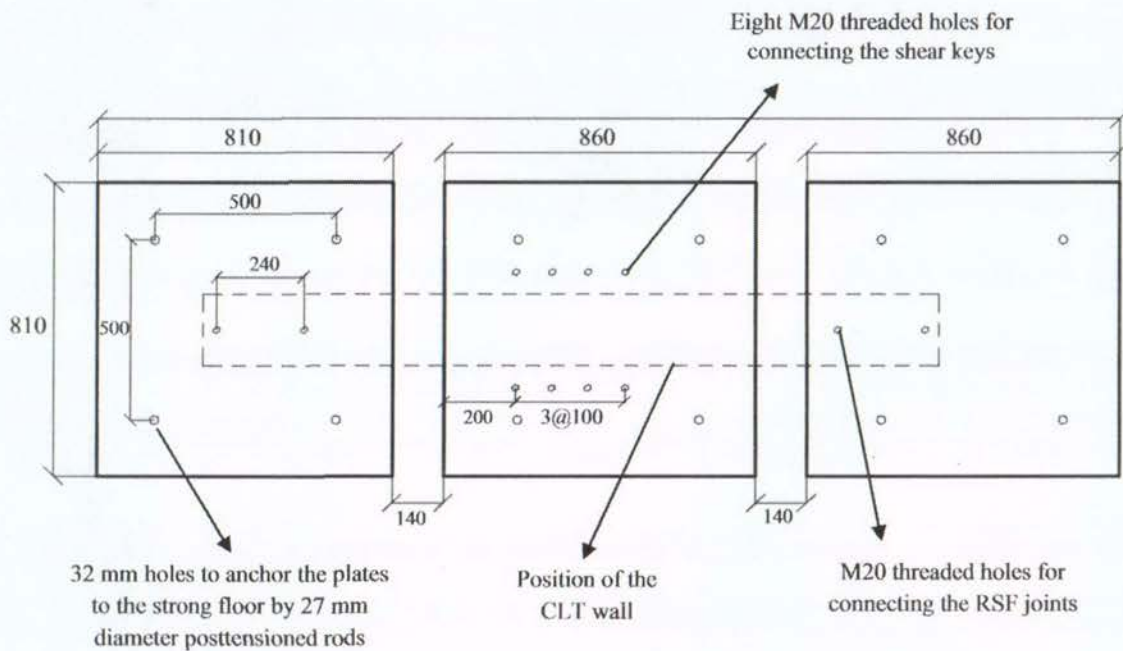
General arrangement of the foundation plates (dimensions in millimeters)
